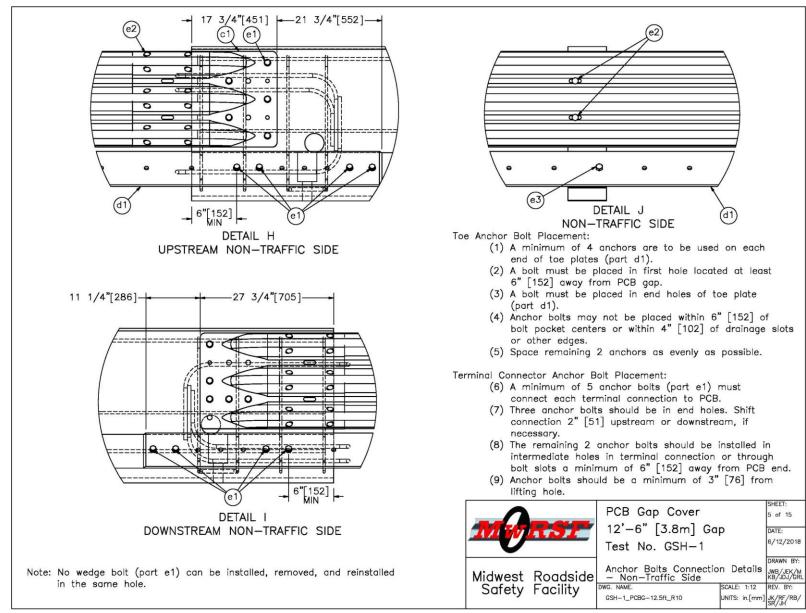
Anchor Bolts Connection Details – Non-Traffic Side, Test No. GSH-1
